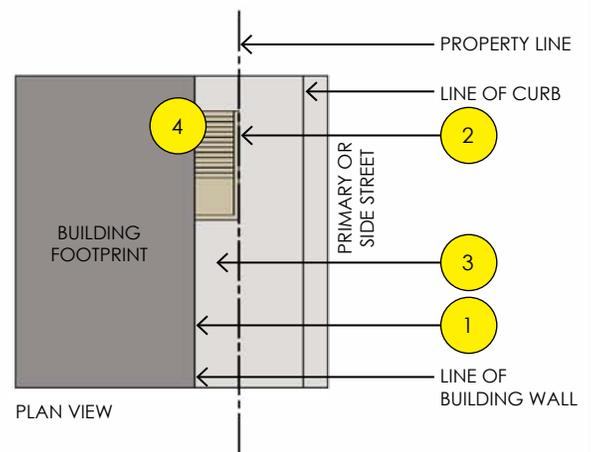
MIXED-USE BUILDING WITH LIGHTWELL FRONTAGE
